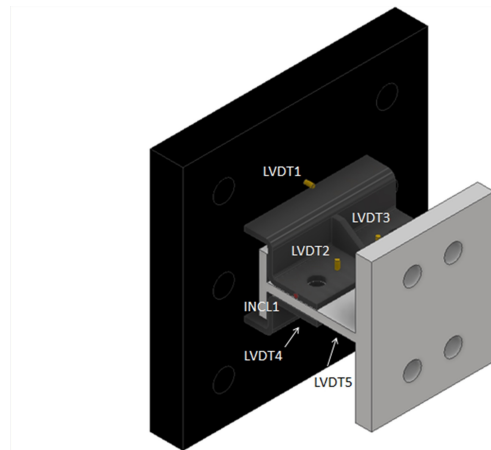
Instrumentation arrangement B-RP specimen: T-plug (10 mm) and reverse channel (6 mm) in bending, with stiffeners.
